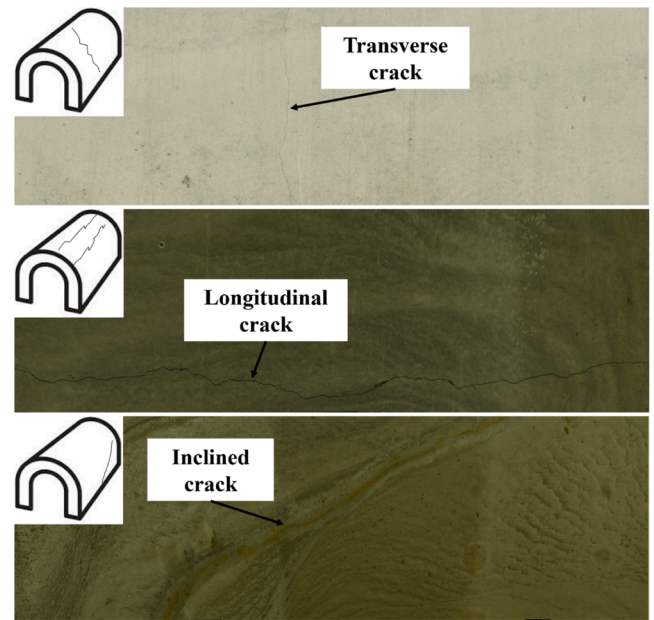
Three main patterns of the lining crack, including transverse crack, longitudinal crack, and inclined crack.
